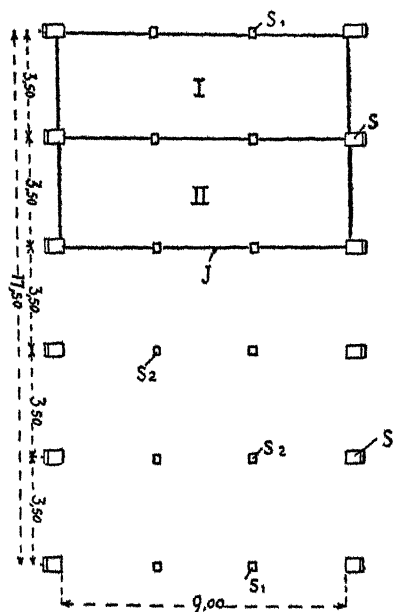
Plan of manure storage plant (21 m. by 9 m.).
